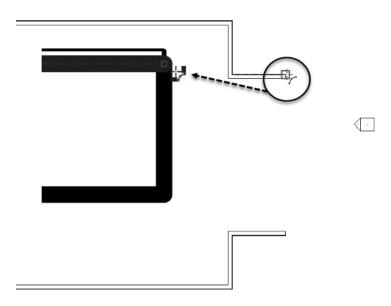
2 9 Select the top corner of the wall to start your new radial wall.
